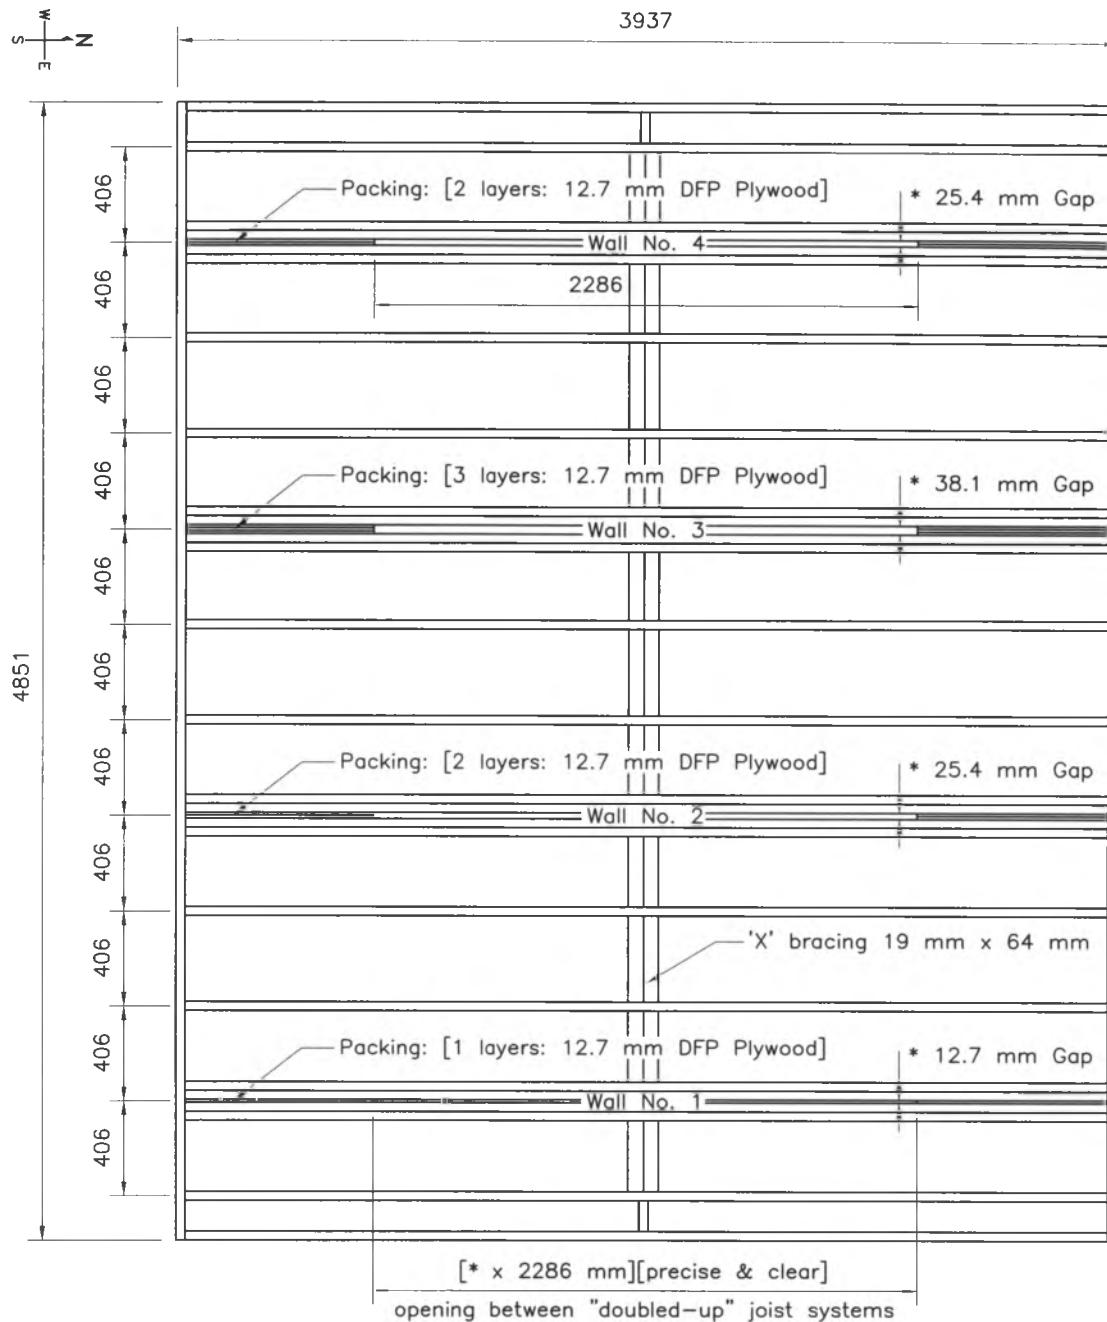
Assembly No. 2, Wall No. 1 Layout (Section E-E)
